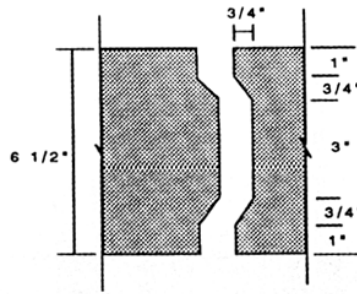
Tongue-and-groove-type joint for bridge deck panels (Ref 7)
